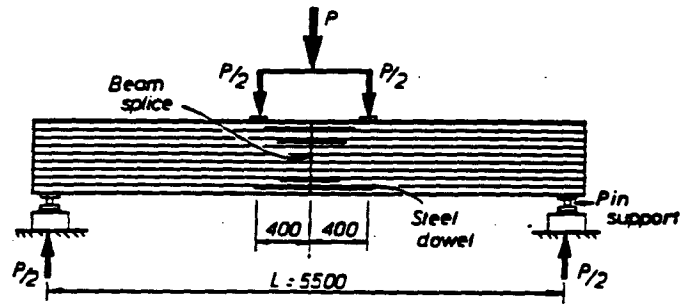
Beam splice joint, Townsend, Buchanan, (1990)
